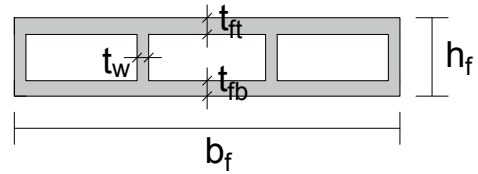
Cross-sectional view of the multicell-box floor girder in x-direction
